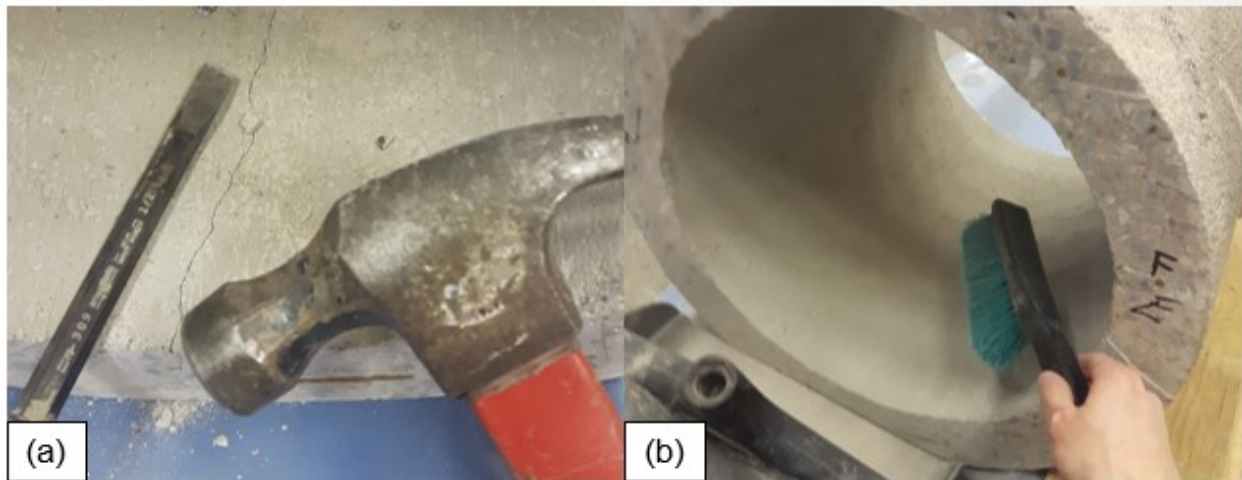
(a) Removal of Protrusions (b) Dust Removal with Brush and Compressed Air
